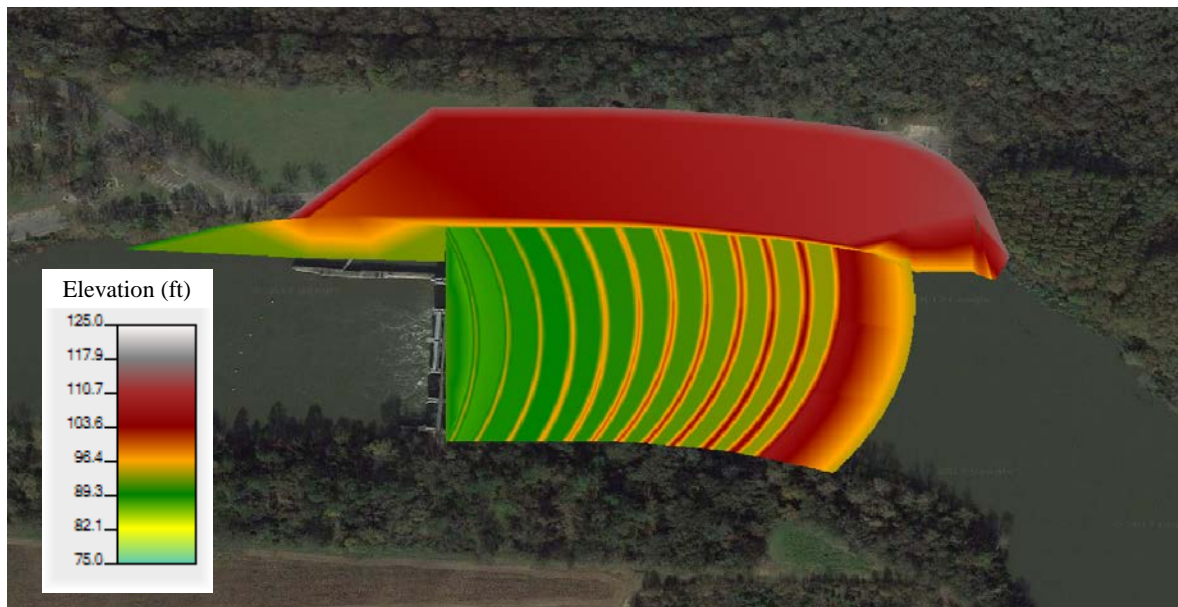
Alternative 2-6d (Recommended Plan) with Elevation¹
